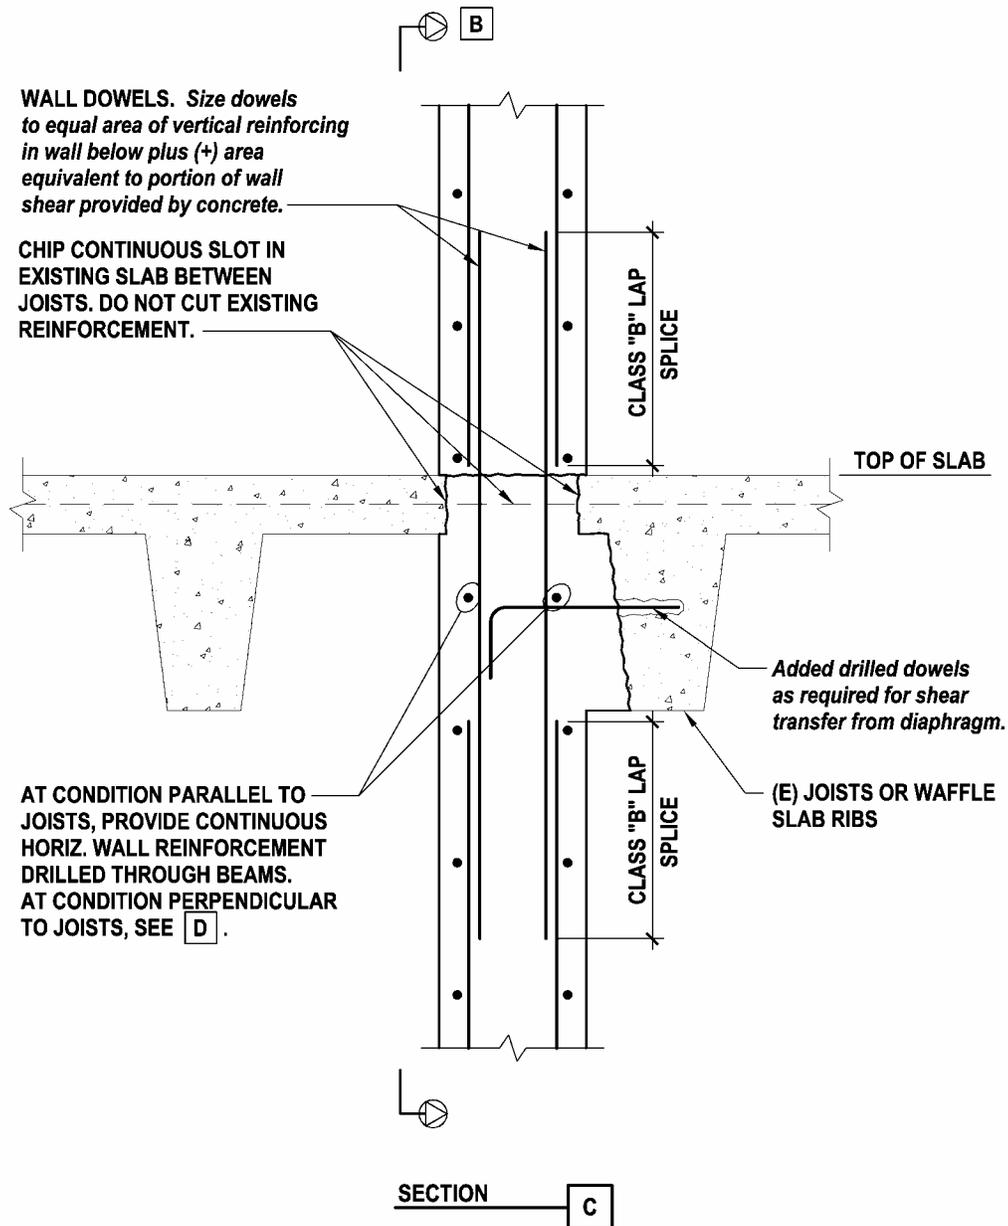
C: Connection of Concrete Wall to Concrete Joists or Waffle Slab
